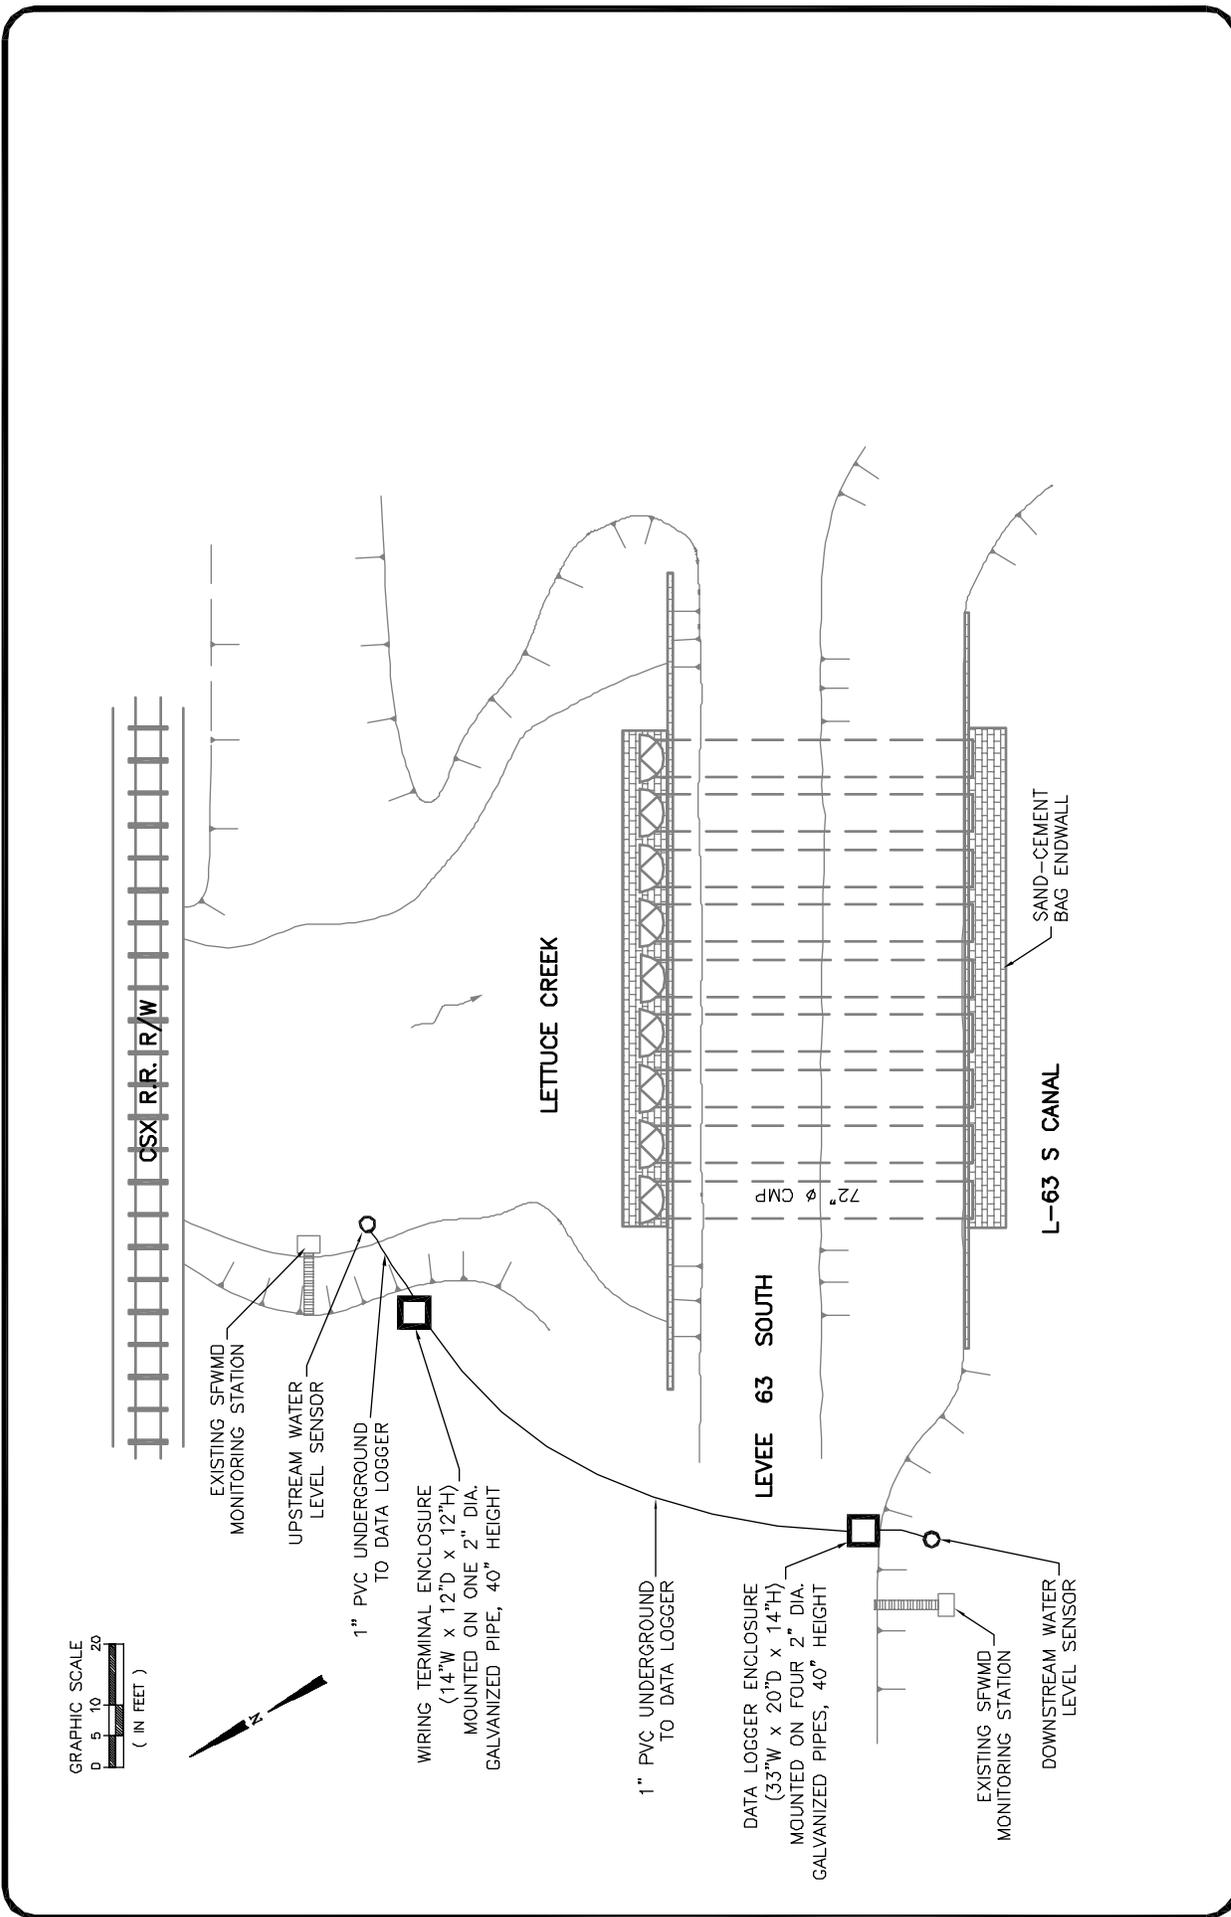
Locations of Initial Hydrologic Monitoring Equipment Installed at the Lettuce Creek Site.
